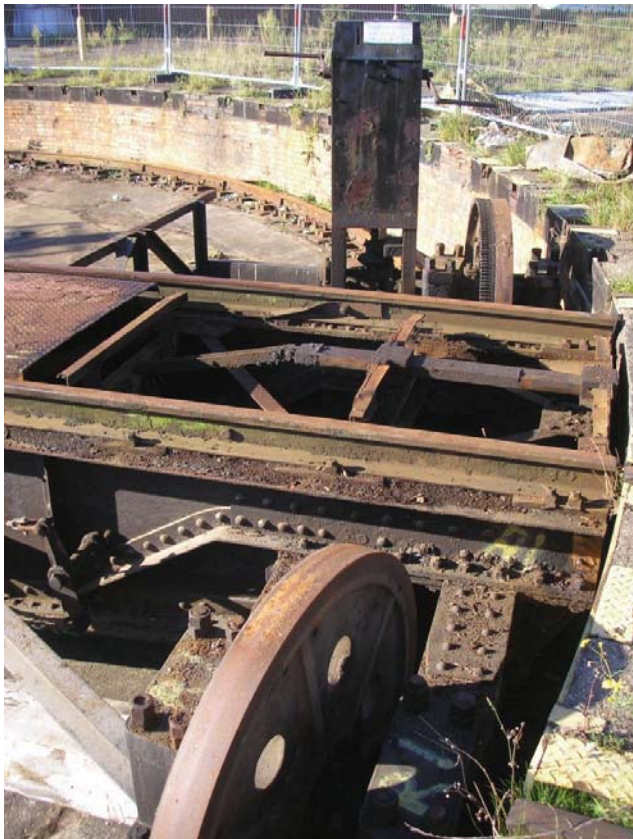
Hand crank and locking bolt exposed between turntable rails.
